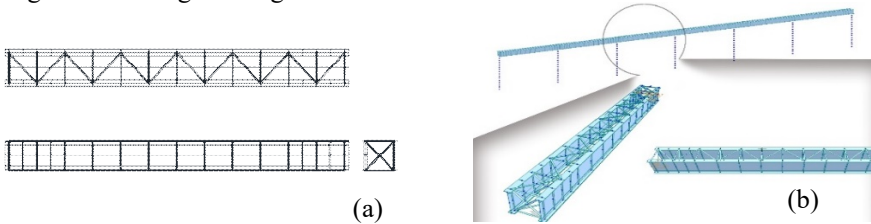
Overview of top-loading steel plate girder bridges : (a) Three views of the steel bridge single-span structure; (b) Finite element model of the main bridge
